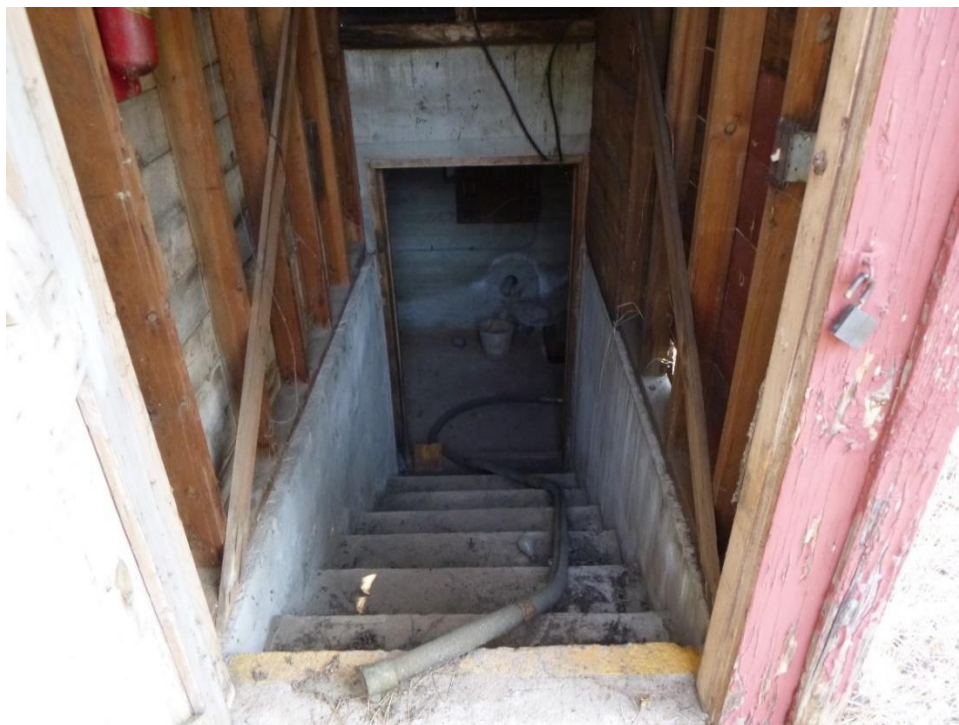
Stairwell of Old Well House (16-71), view from entrance.
